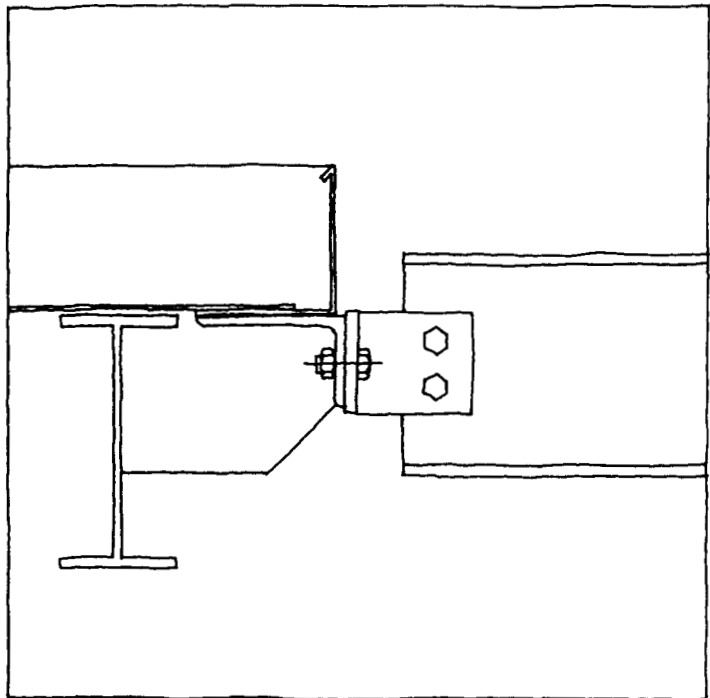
Divider beam connection to edge beam based upon welded plate
